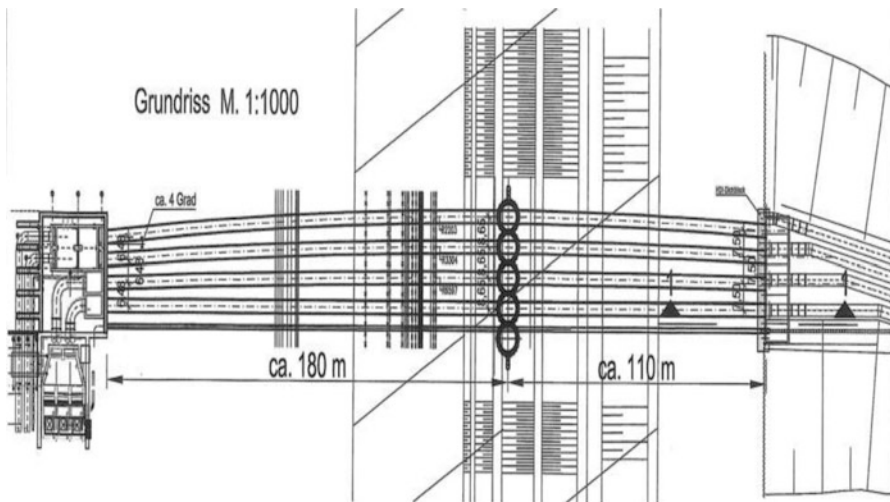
Alignment of the tunnels crossing diaphragm wall in embankment area
